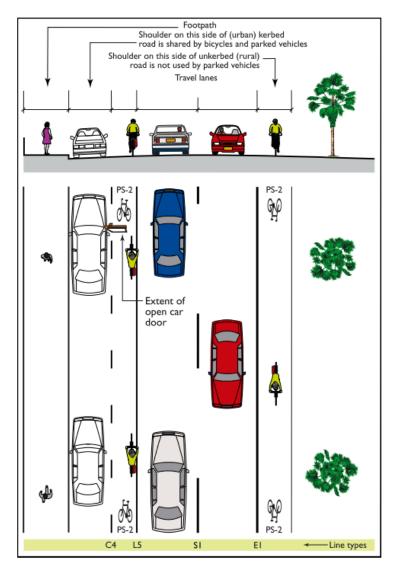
Typical Plan and Cross-Section for On-Road Bicycle Paths
